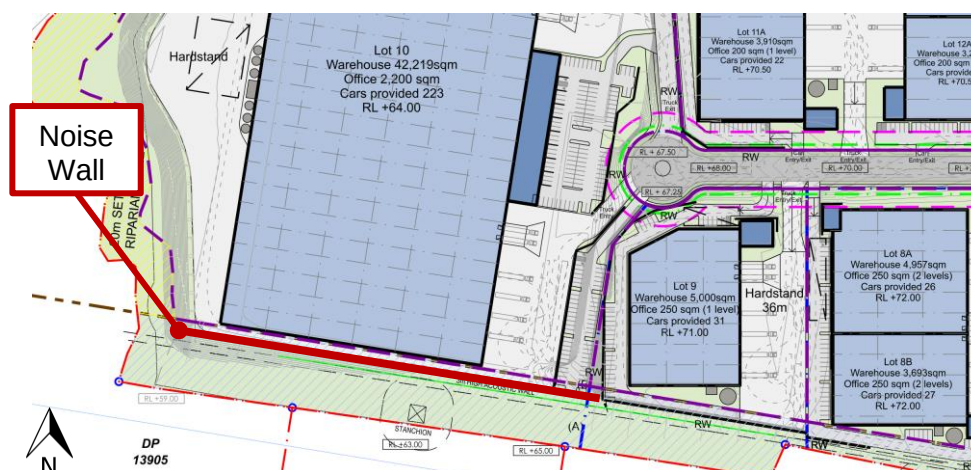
| Location of the Proposed Noise Wall to the south of warehouse building 10
